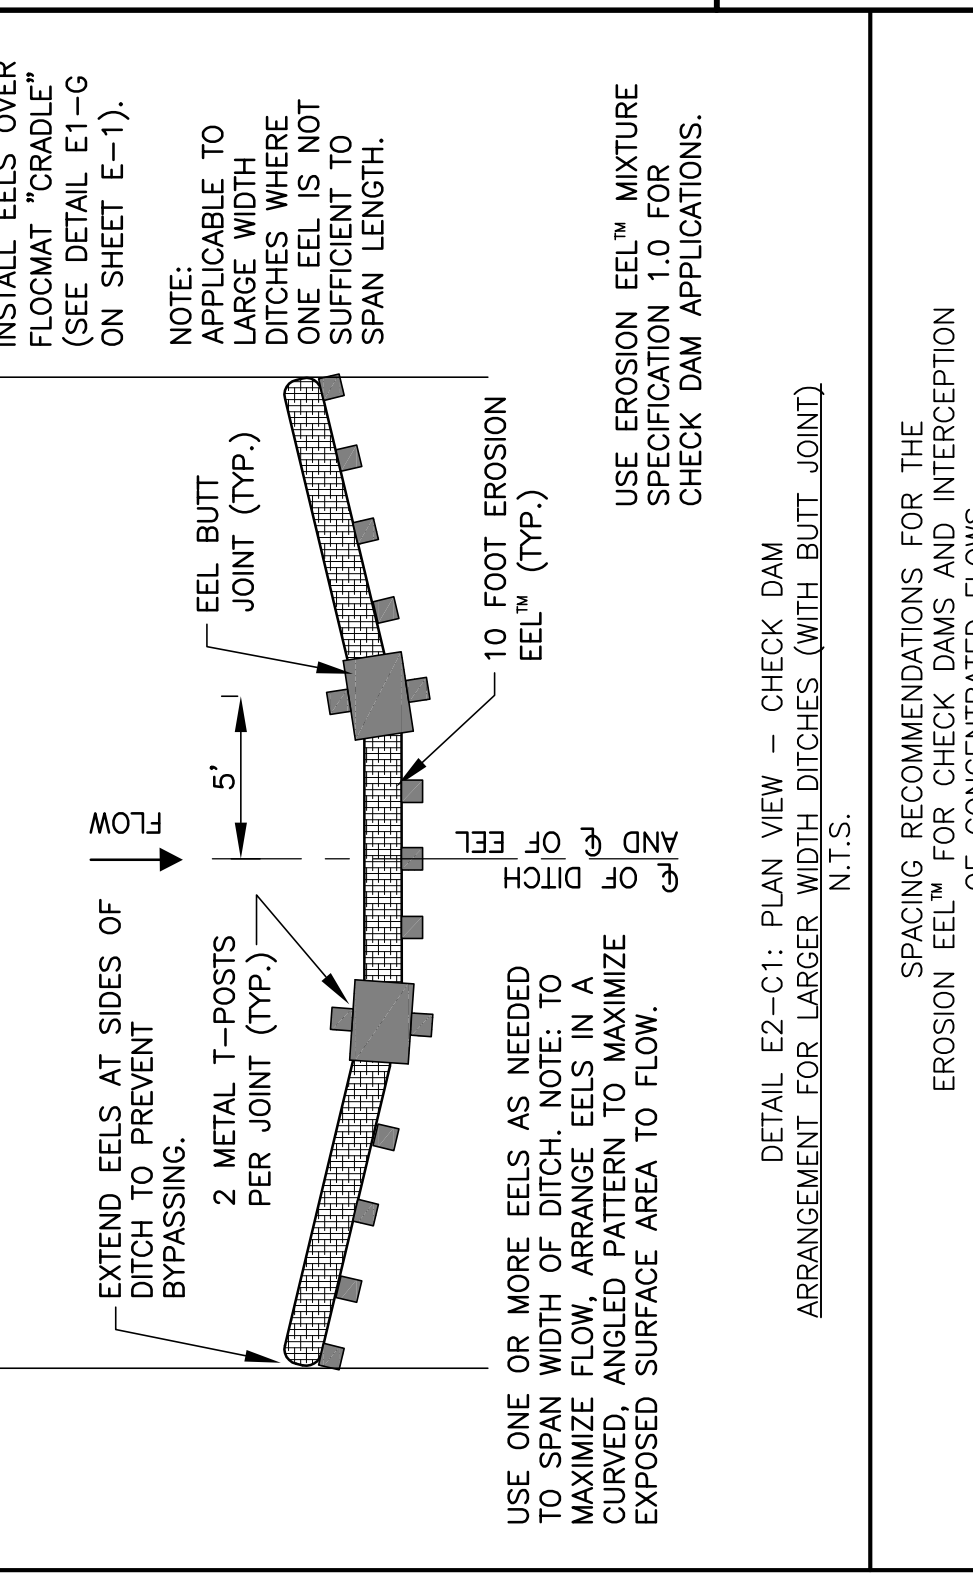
C1: PLAN VIEW – CHECK DAM ARRANGEMENT FOR LARGER WIDTH DITCHES (WITH BUTT JOINT) N.T.S.
